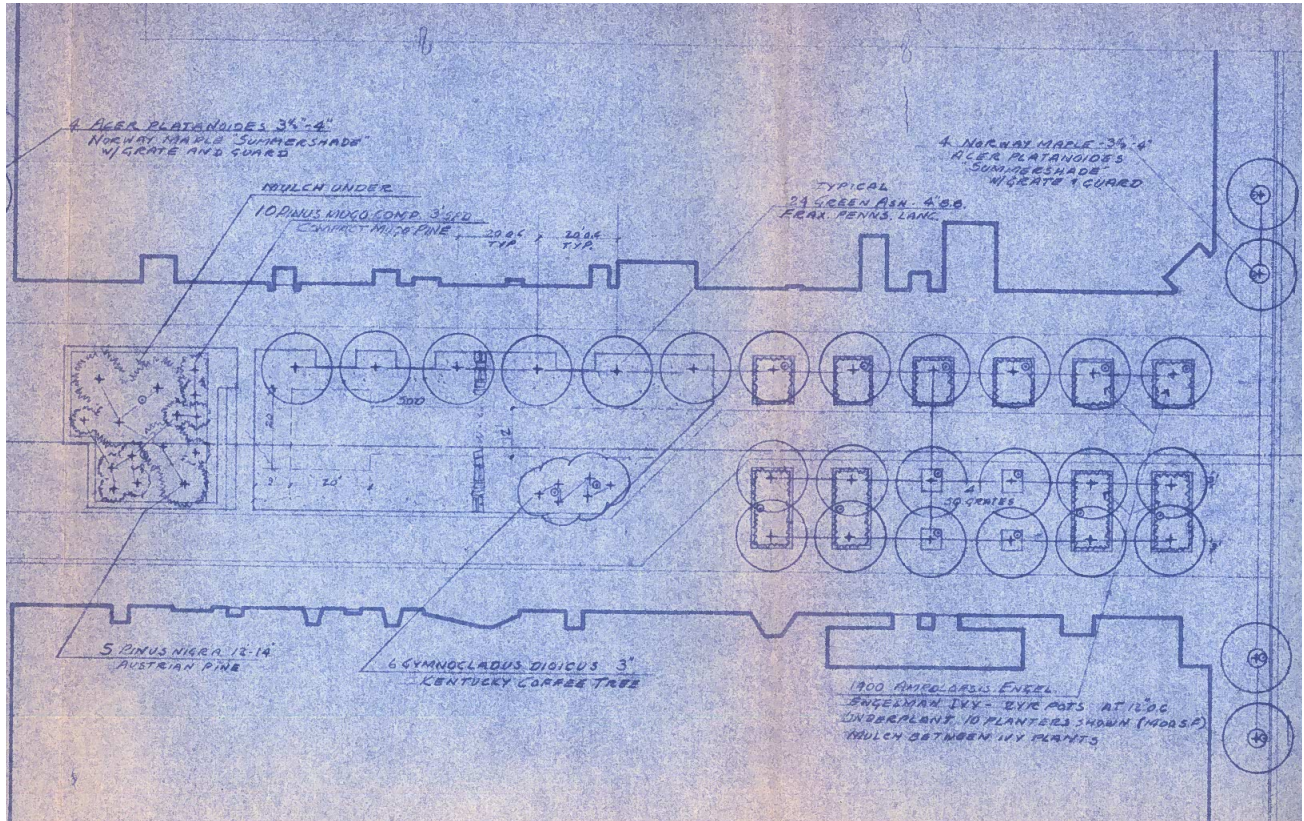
Pearl Street Mall construction documents planting plan 1100 Block, 1976 (source: City of Boulder)
